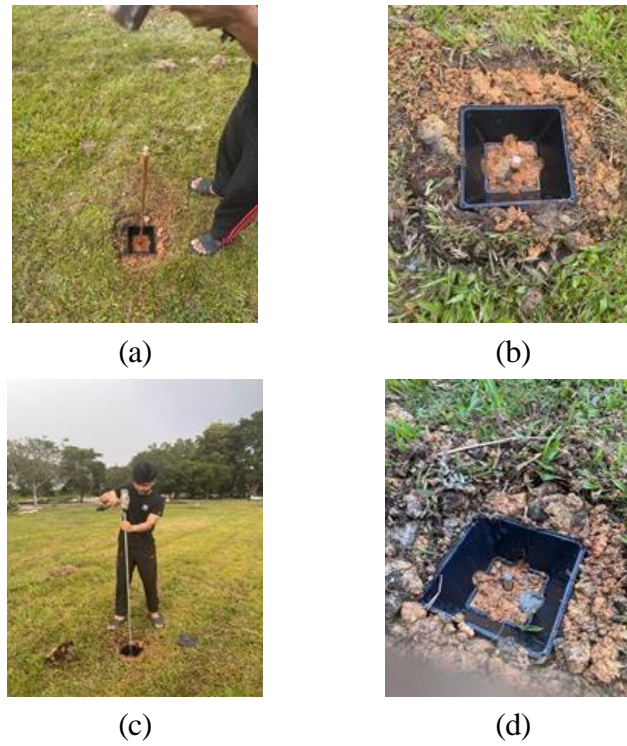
Single rod installation (a) Hit the copper rod, (b) Single rod copper, (c) Hit the aluminium rod and (d) Single rod aluminium
